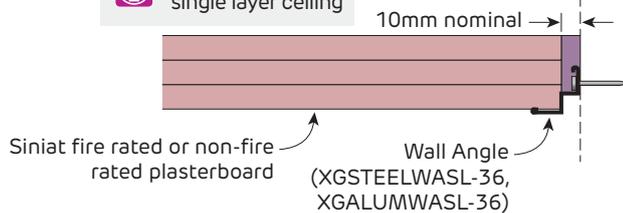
Finishing Detail - Shadowline Wall Angle Section
